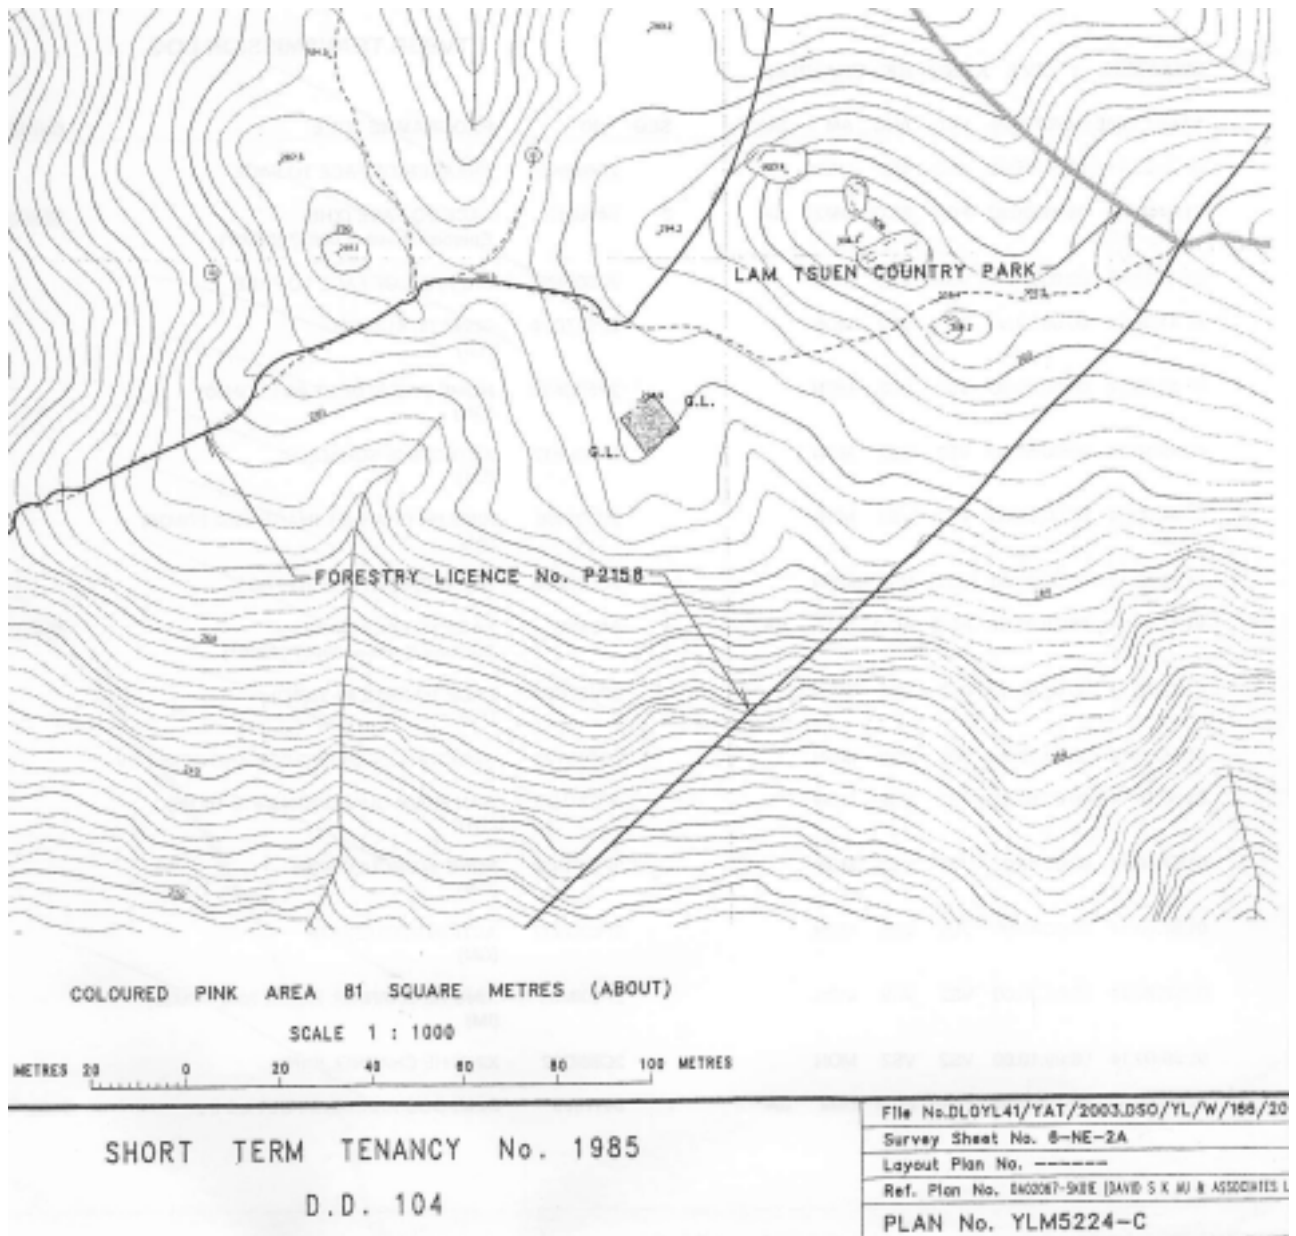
Site plan of Hill 374 Transposer Station (to be known as STT No. 1985 D.D. 104)
